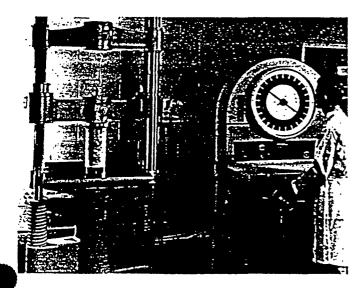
Testing a 6x12-in. concrete cylinder in compression. The load on the test cylinder is registered on the scale.
